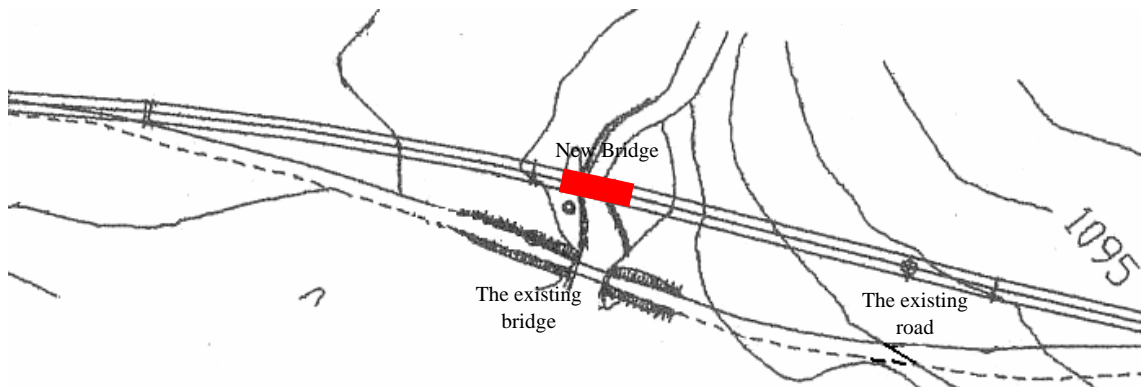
Plan of Murun Bridge Site and its Surroundings
